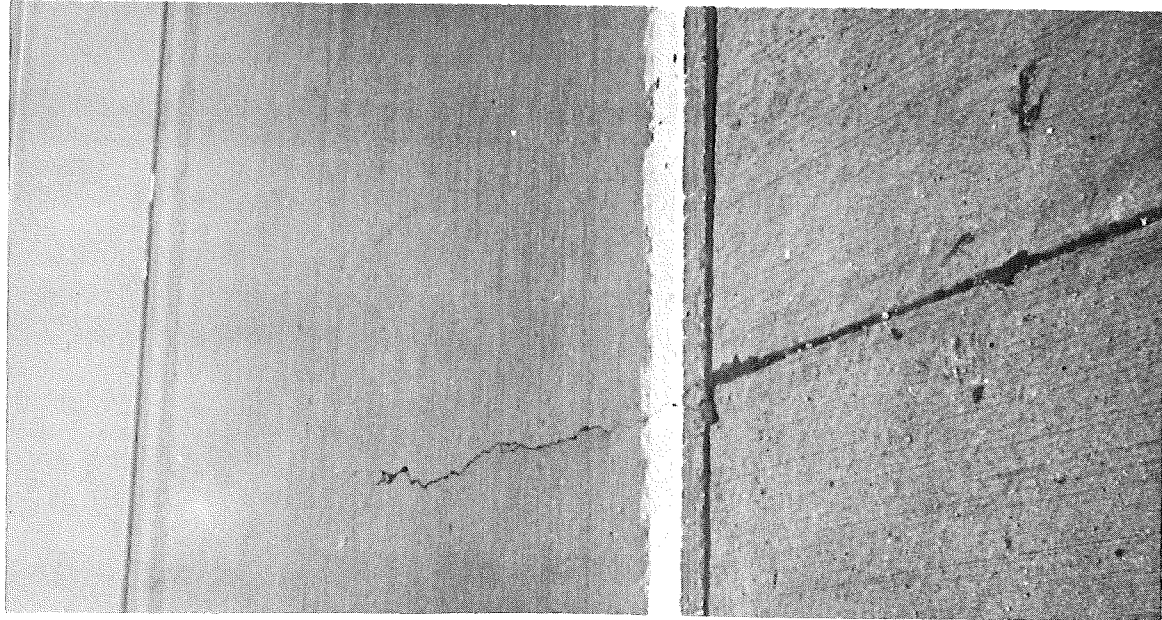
(right). Commutative cracking in continuously reinforced concrete pavement at shoulder joint.
